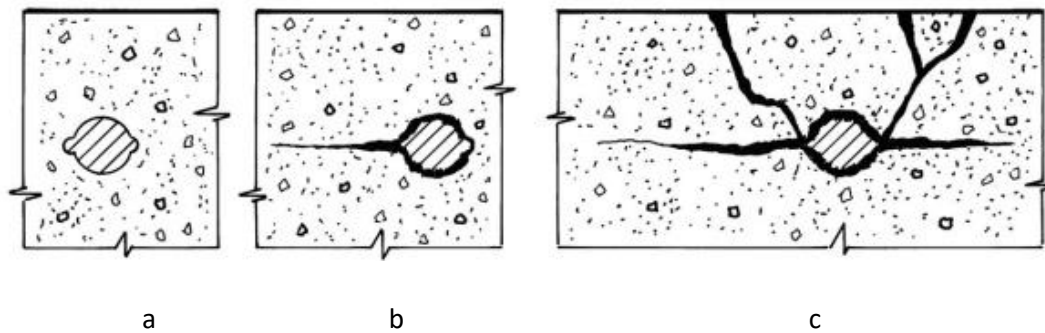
Corrosion induced cracking of concrete (a. steel bar in the passive state, b. internal crack within the concrete cause by rust growth, c. spalling of concrete by expansive rust products) [32]
